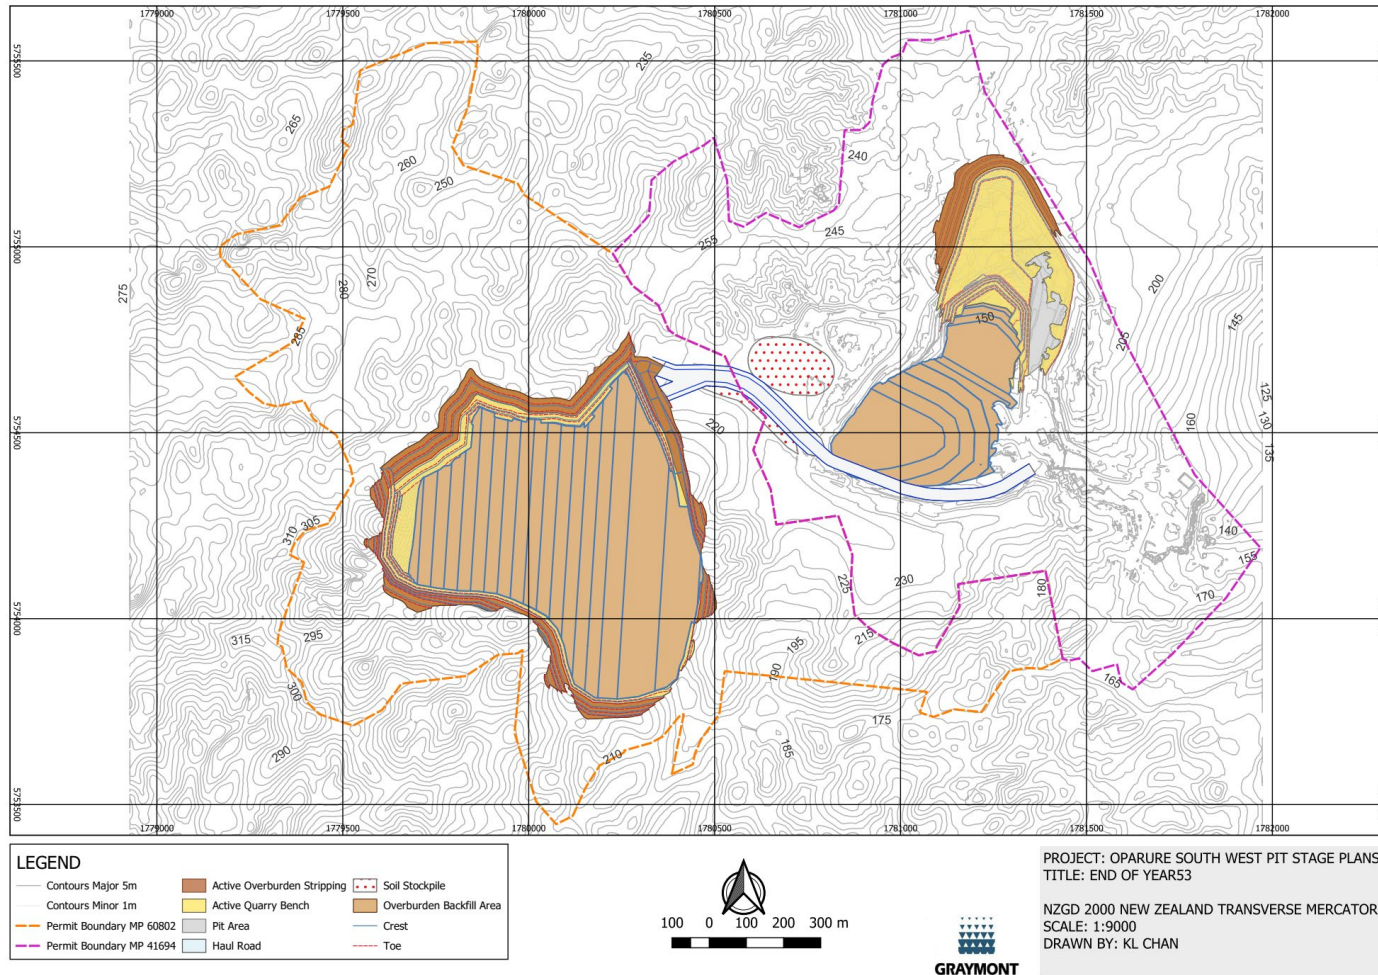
Plan showing the maximum SW Pit outline and haul road to Oparure Pit
